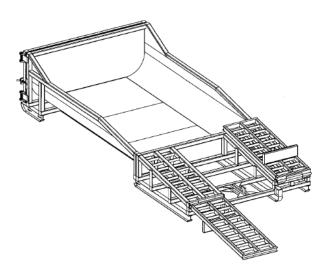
Prefabricated Concrete Washout Container w/Ramp
